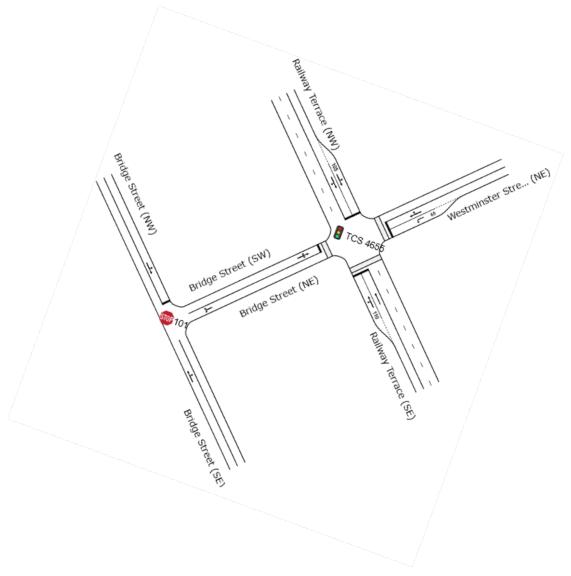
Bridge Street / Westminster Street / Railway Terrace – intersection layout
